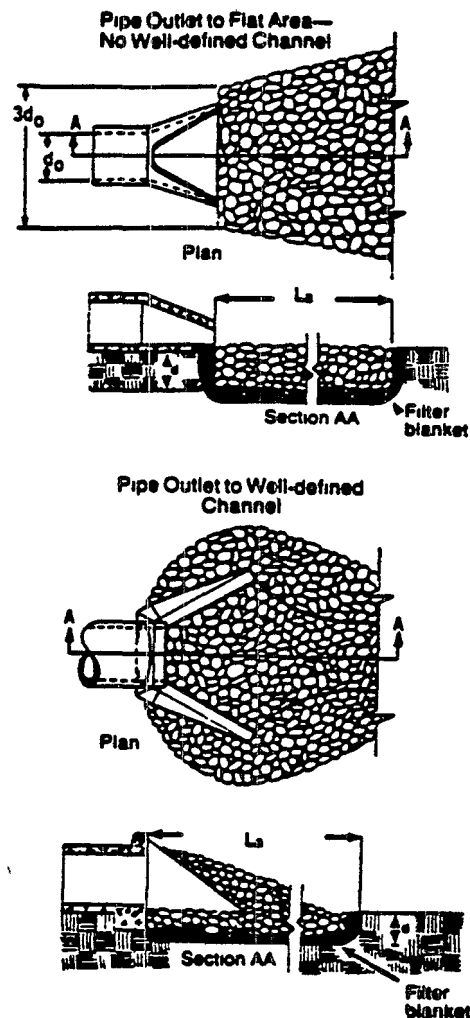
TYPICAL DETAILS FOR ROCK OUTLET PROTECTION
